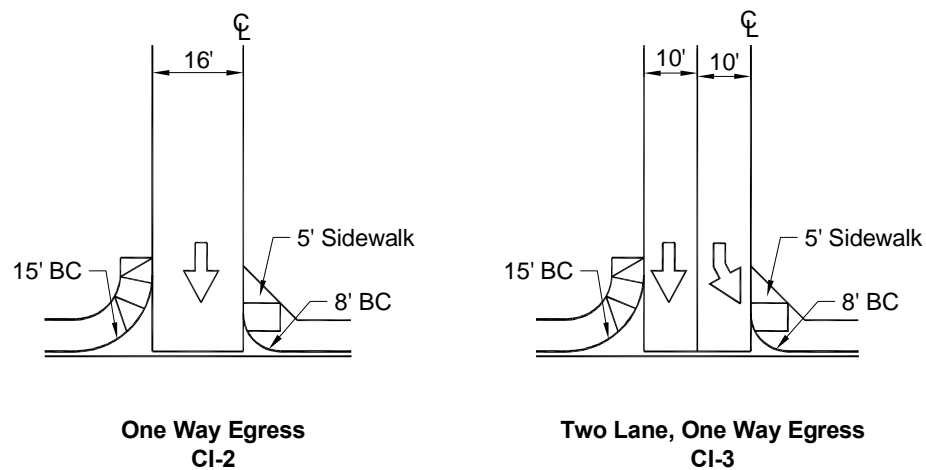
TYPE CI ONE WAY EGRESS DRIVEWAYS
